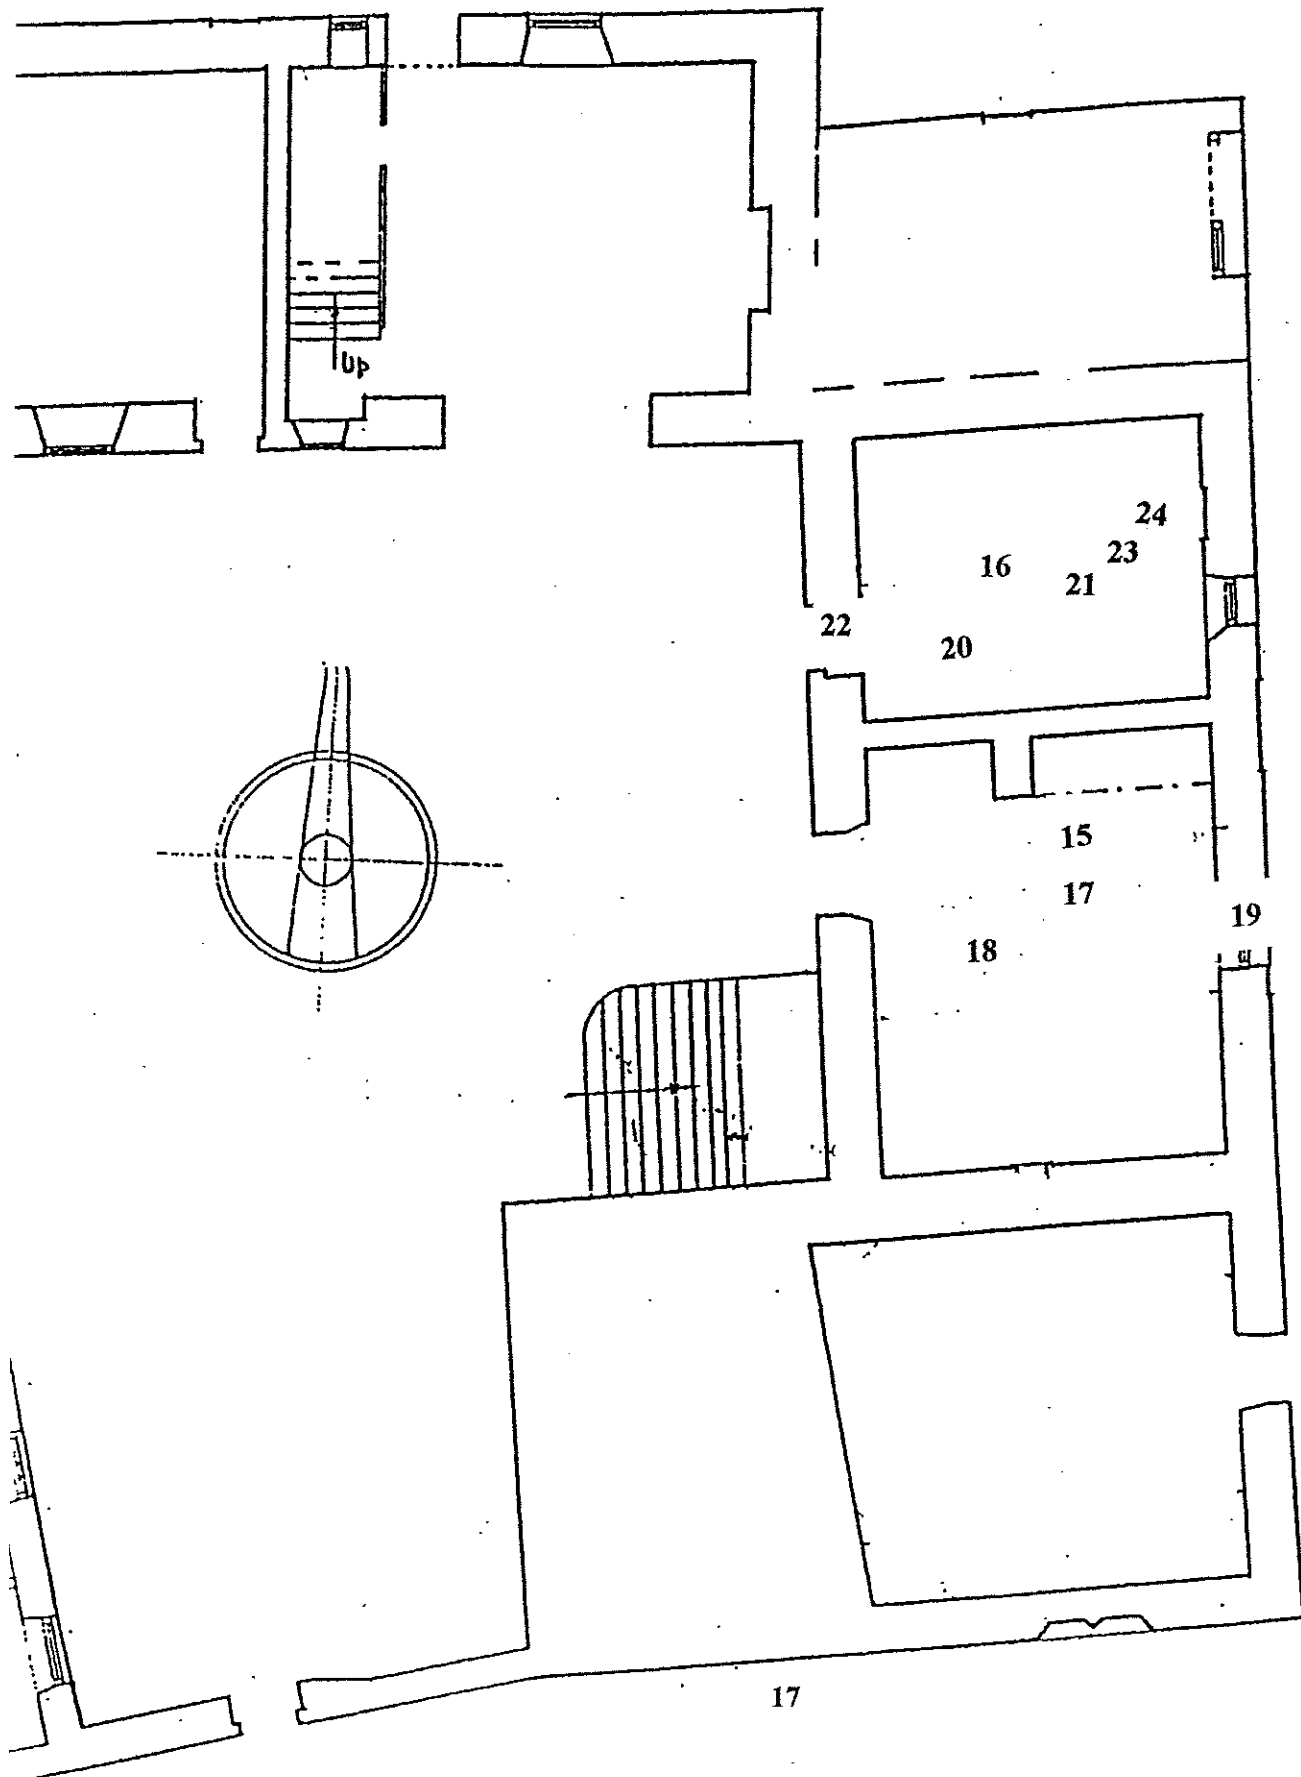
Plan to show approximate location of sampled timbers from the North range (east end) and the carriageway
